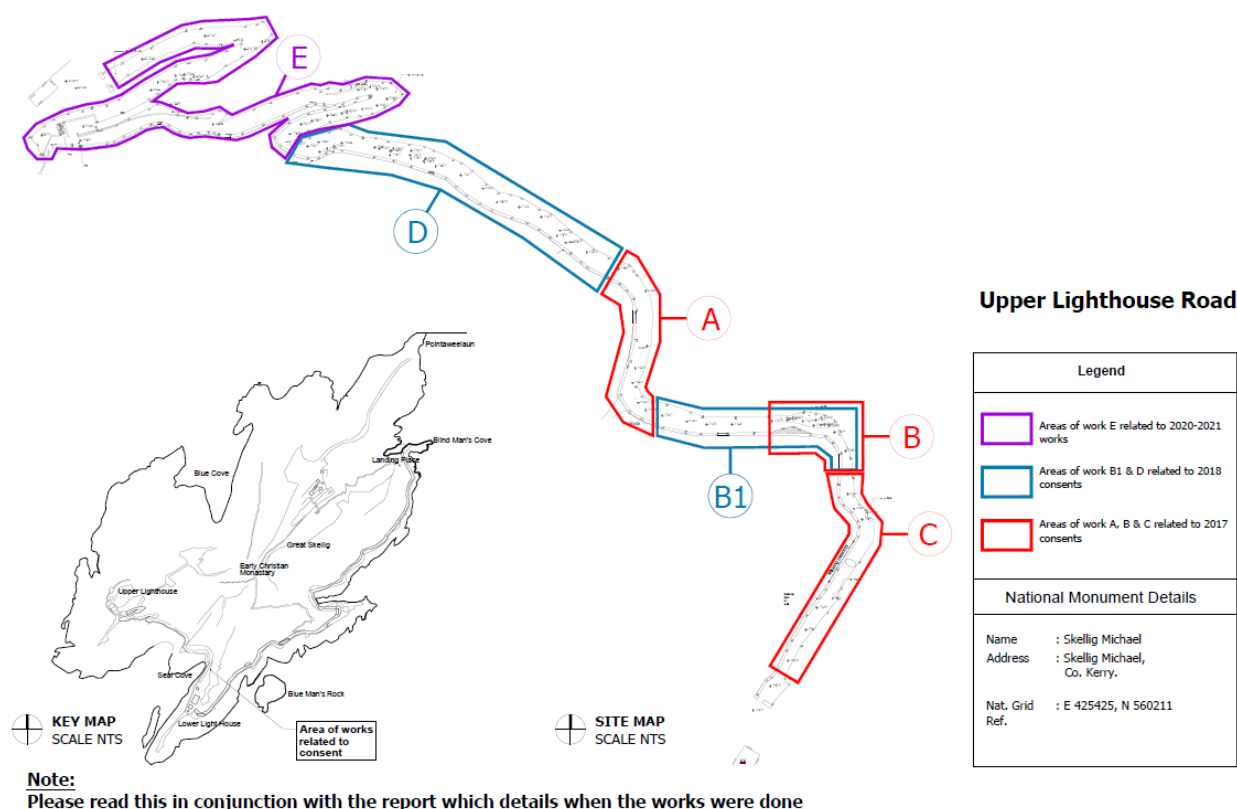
Works to Upper Lighthouse Road 2017 - 2021
